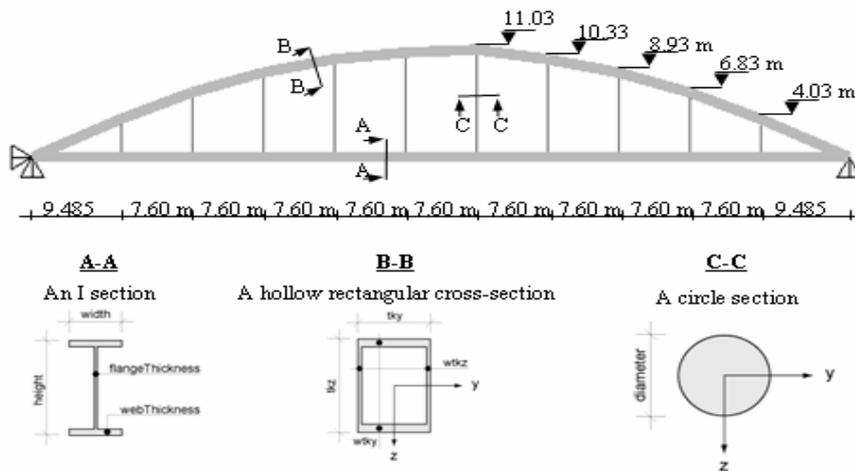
The topology and geometrical properties of the cross-section of 2D Arch Bridge
